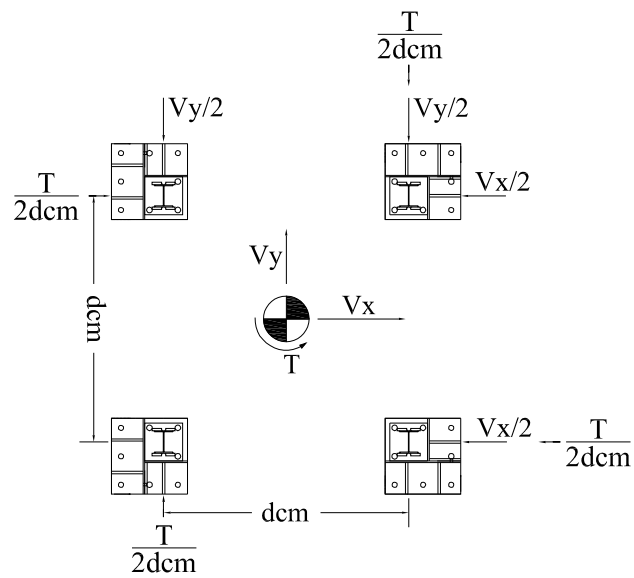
Shear Transfer at Base of Pier Using “Pit” Connection
